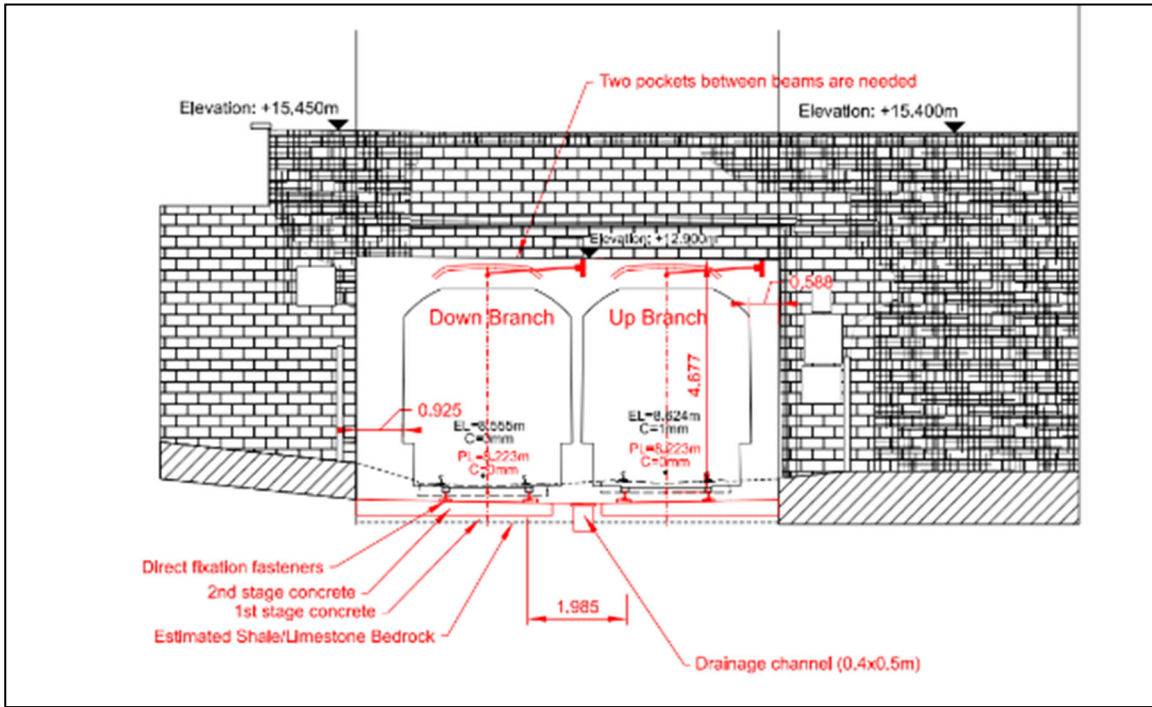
Conyngham Road Bridge (OBO2) – Cross Section at Ch 8+771, View Towards Heuston West
